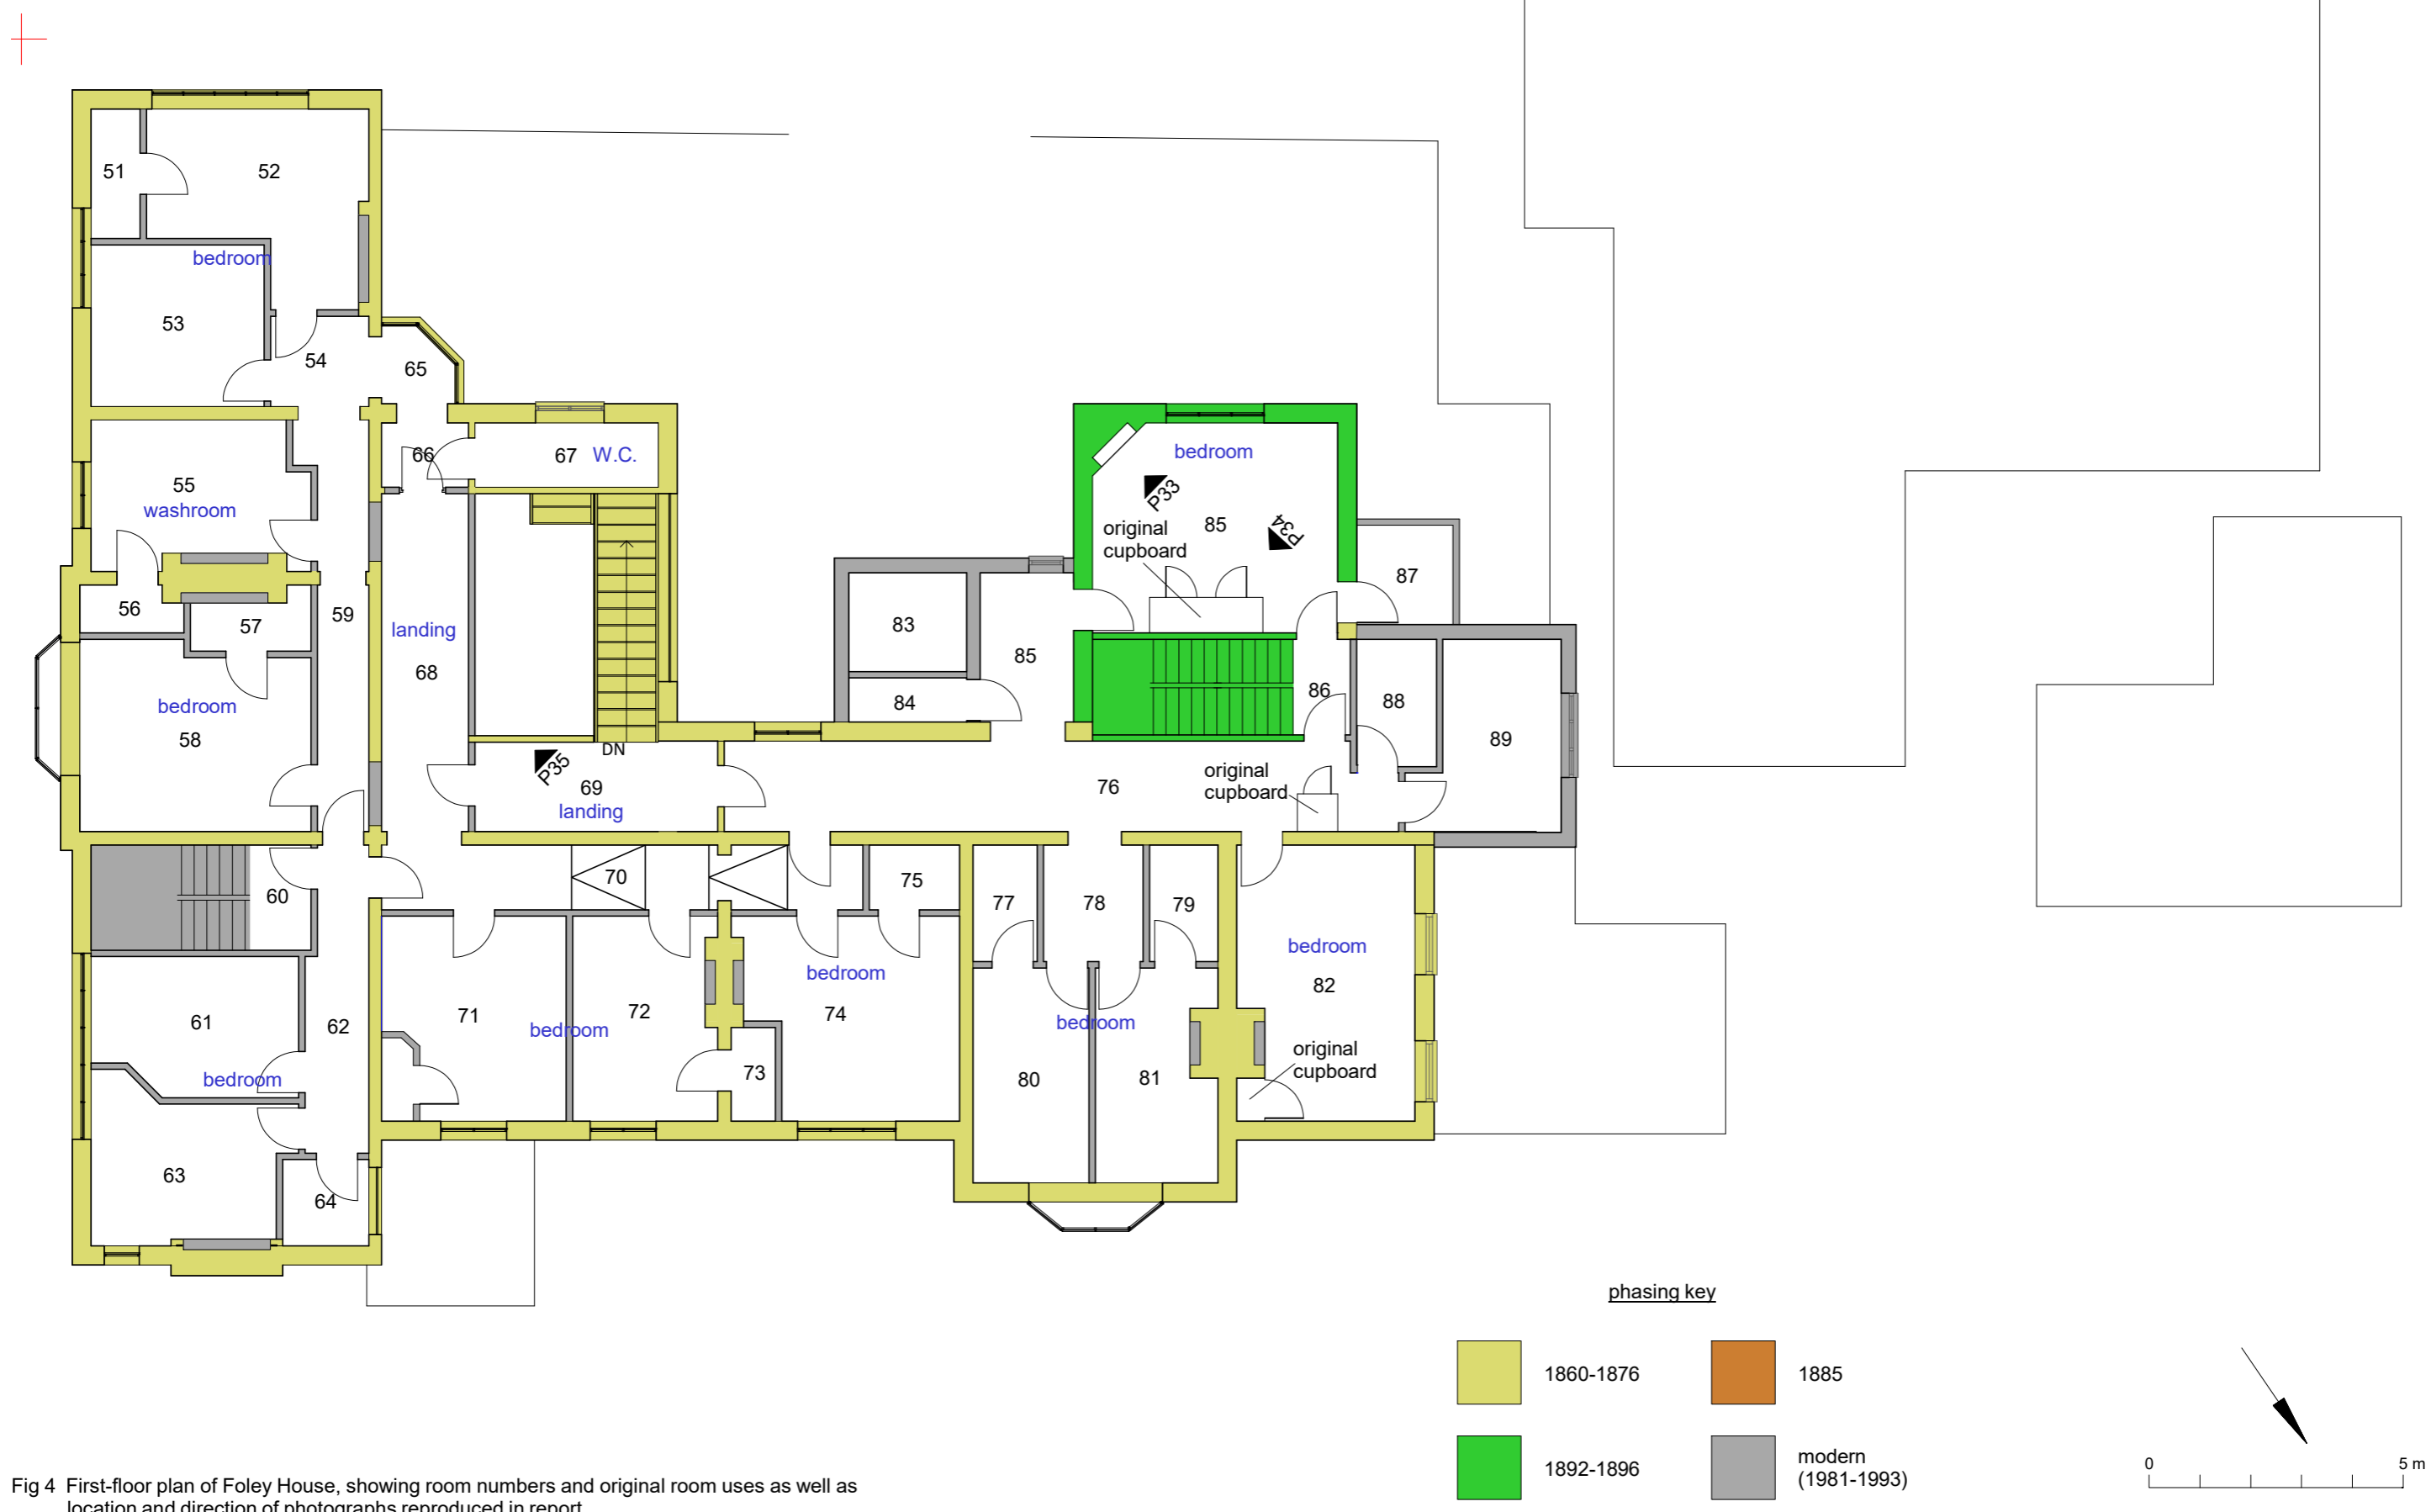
First-floor plan of Foley House, showing room numbers and original room uses as well as location and direction of photographs reproduced in report.
